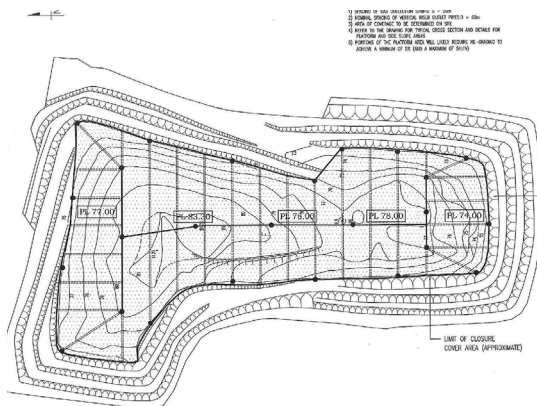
Plan of final cover system: Area A in Air Hitam Sanitary Landfill
